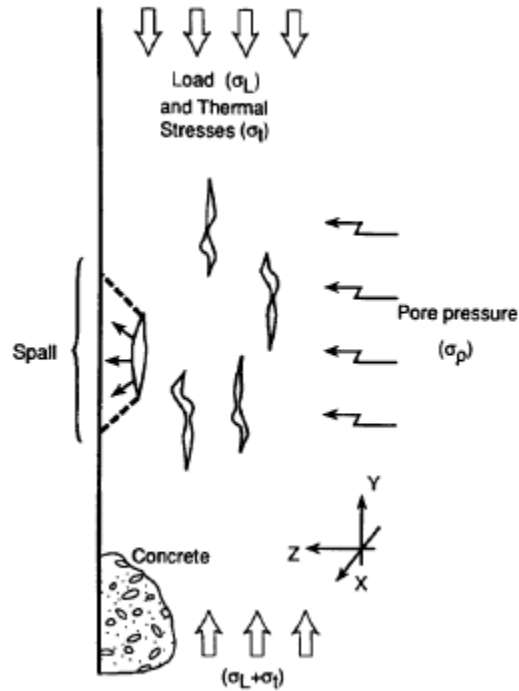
Stresses acting in heated concrete (after Zhukov, 1976).
